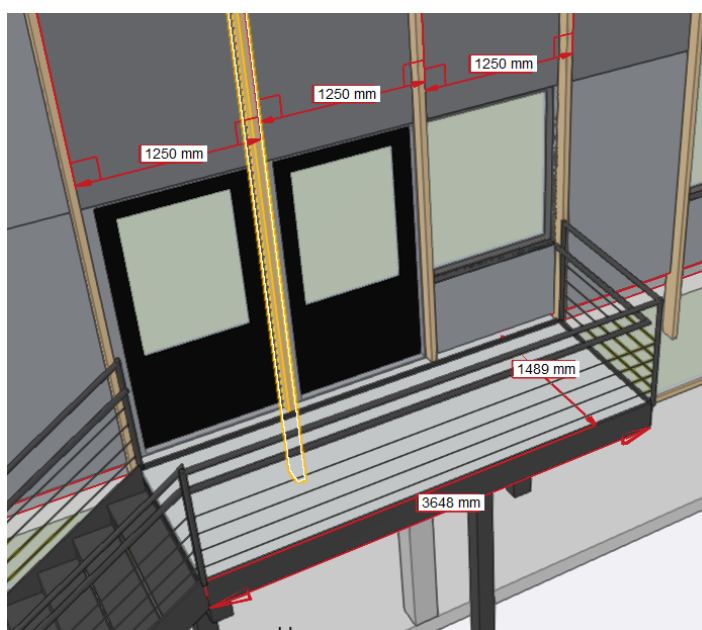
Dimensions of the existing platform to consider the dimensions of the baldakin
